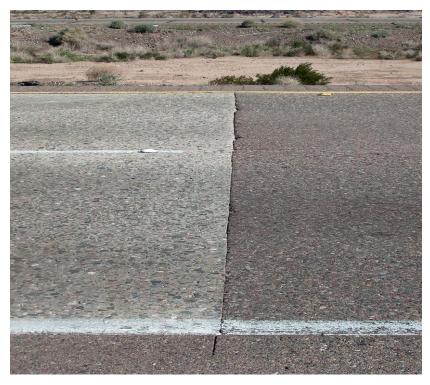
Faulting at PCC to Asphalt Pavement Transition at 060500
